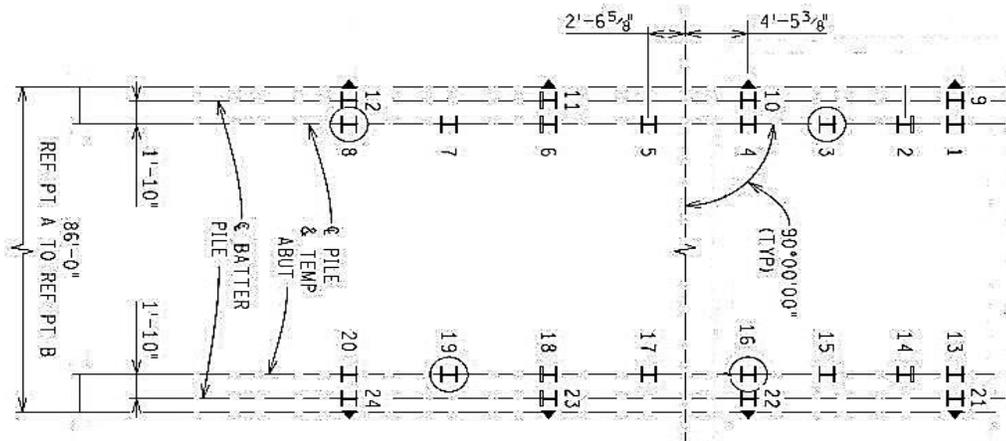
Top view of the US-131 SB bridge temporary extended pile arrangement
